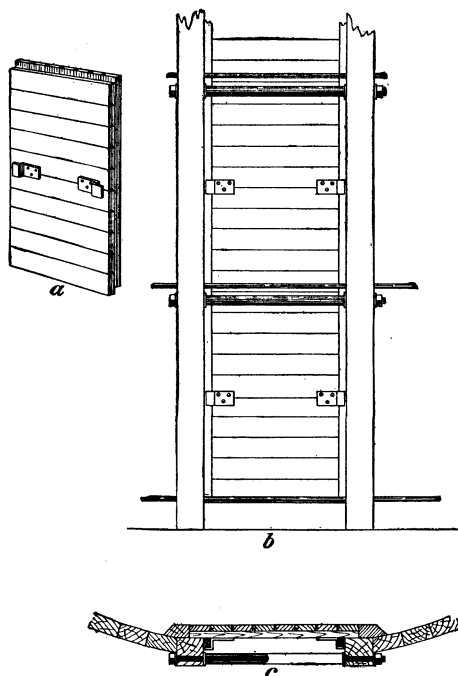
A continuous doorway: *a*, View of door; *b*, doorframe with door in position; *c*, cross section showing door and doorframe.
